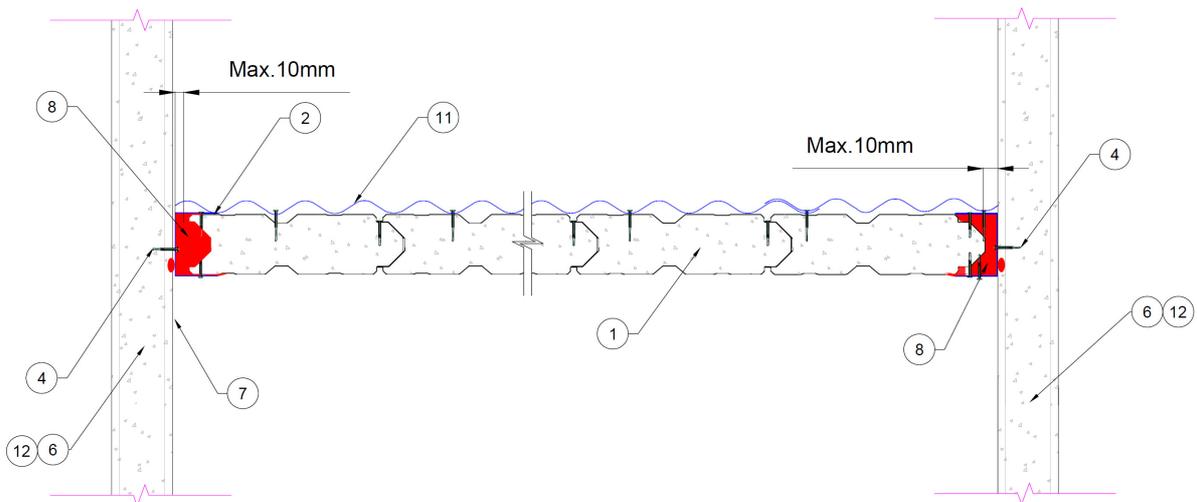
Speedpanel ceiling protected with steel sheeting (Cross Section View)
